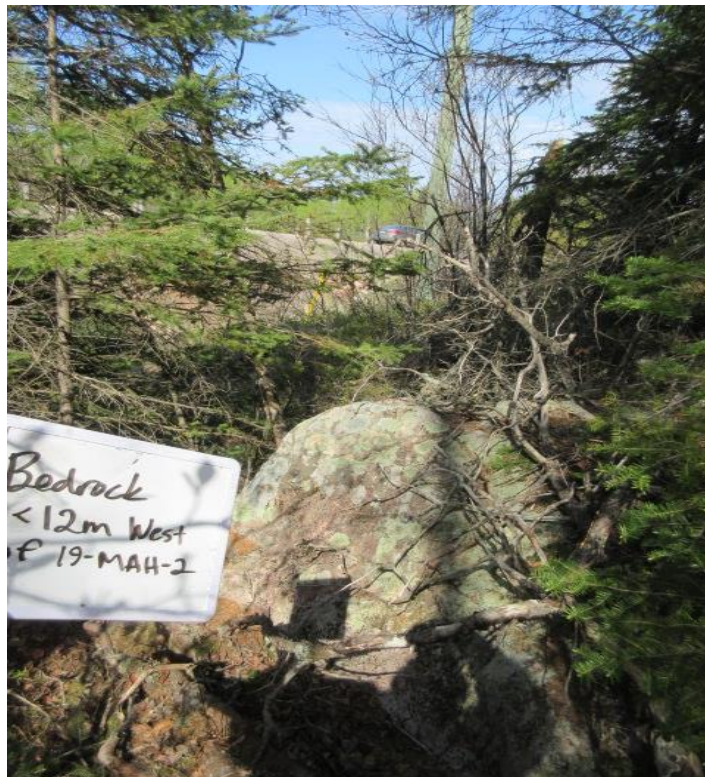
Section A- Bedrock close to 19-MAH-2, west bottom of Hwy 17 existing embankment close to Station 17+025, looking west
